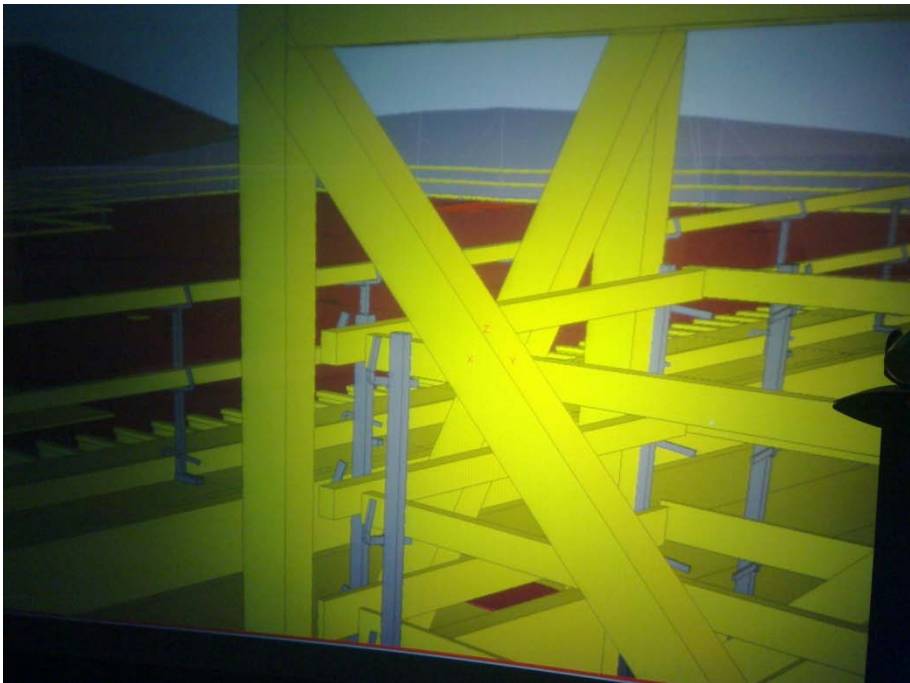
Identified error in the BIM-based falling prevention plan. The safety railing must be outside of tower crane structure.
